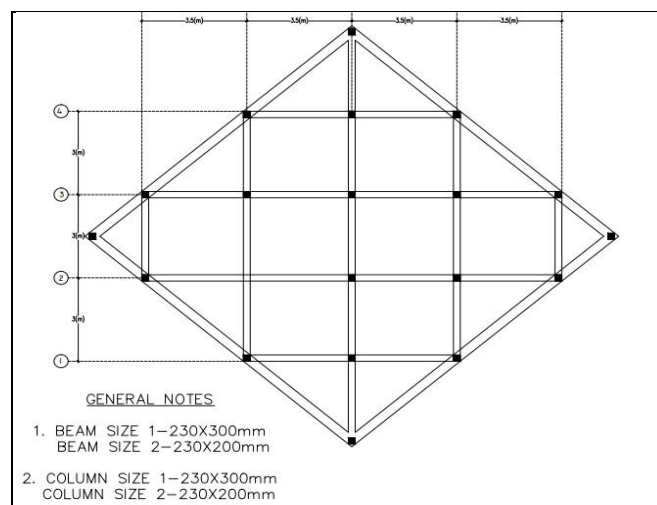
Typical floor plan of storey 3, storey 4 and storey 5
